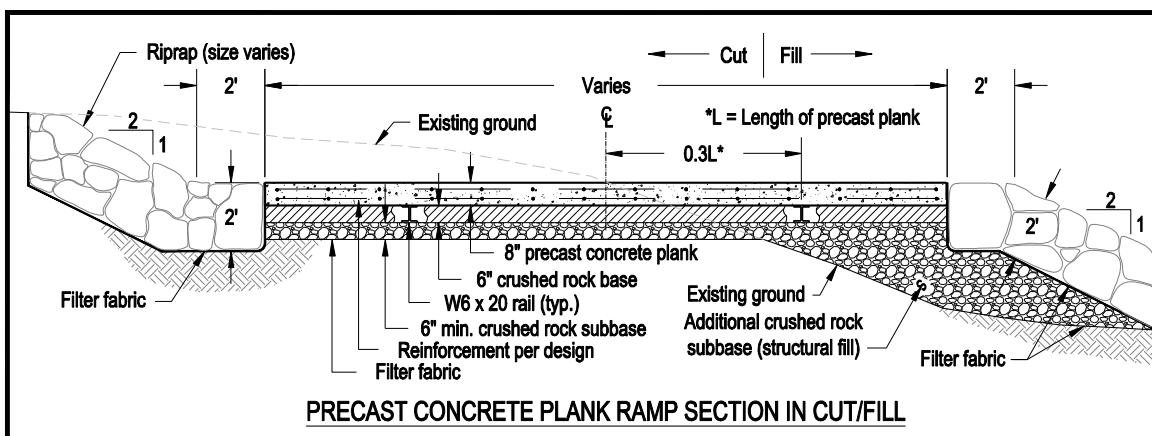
Precast concrete plank ramp section in a cut and/or fill situation
